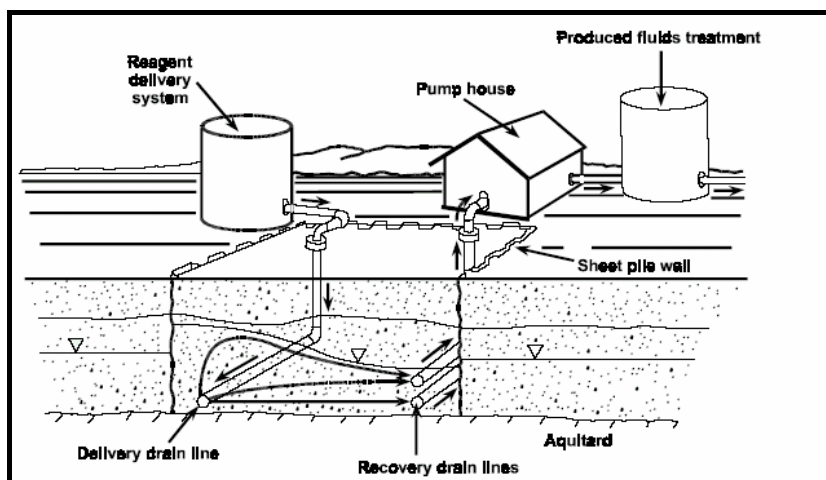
Example of sheet pile walls used in recovery of ground water [80]
